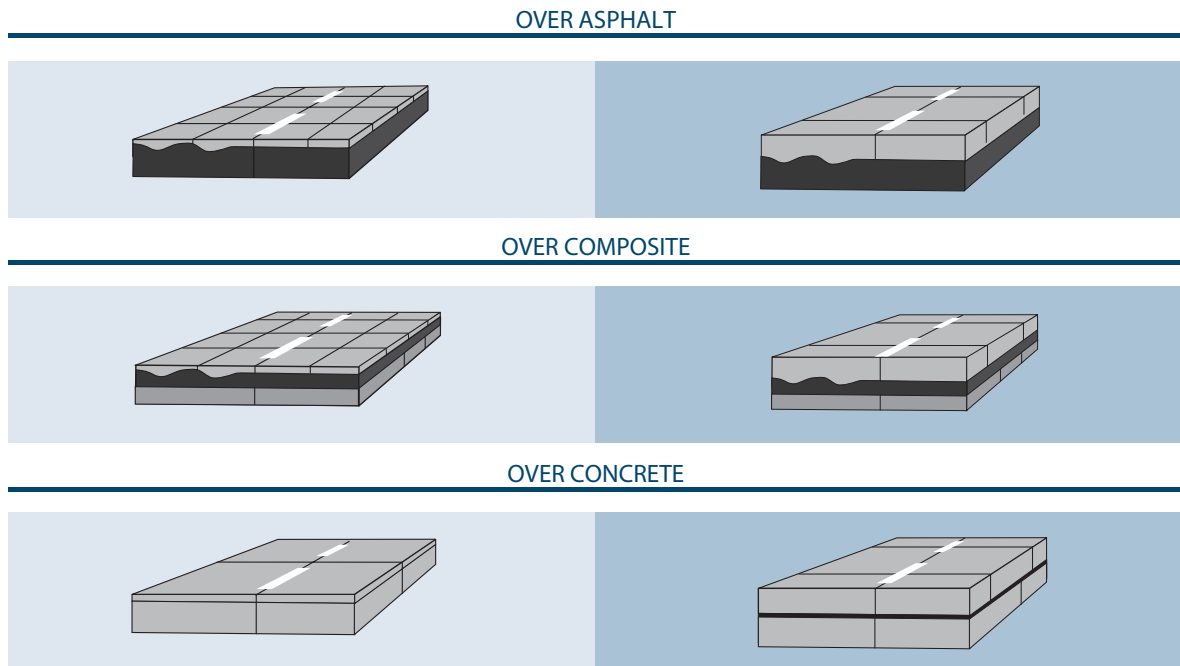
Types of concrete overlays (Harrington and Fick 2014)
